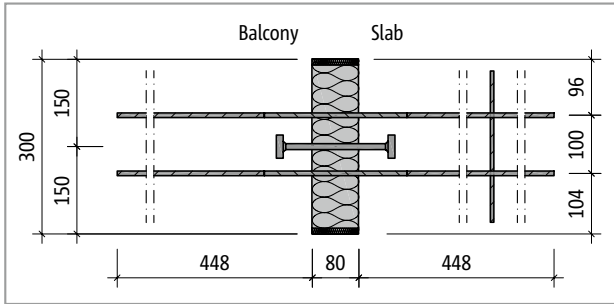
Schöck Isokorb® T type Q-P-V1: Product layout
